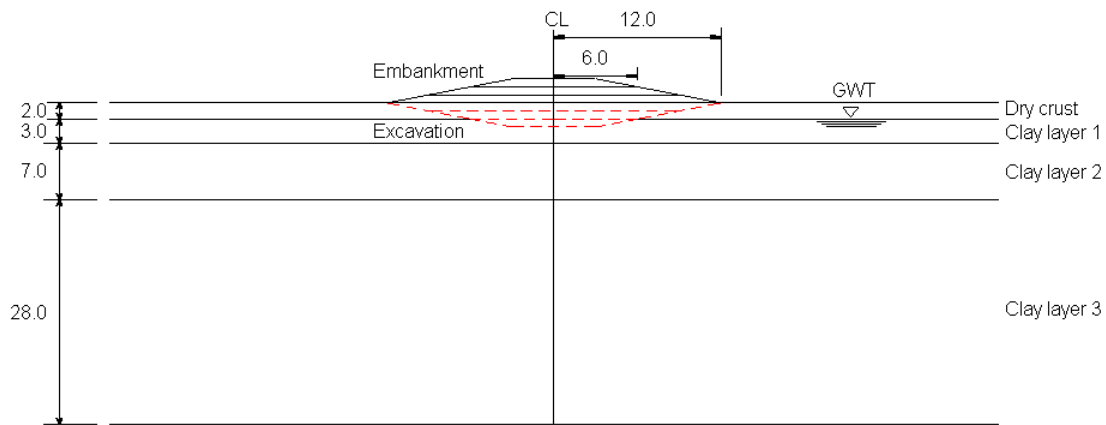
Geometry profile of the model showing soil layers and embankment/excavation construction
